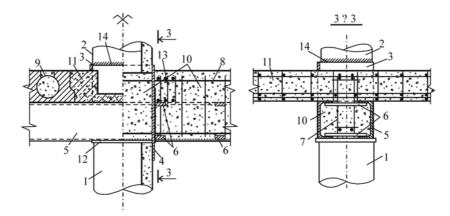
The scheme of the rigid connection of a hollow concrete-filled circular steel tubular column and a continuous composite beam: 1-lower composite column; 2-upper composite column; 3-erection ring for upper column; 4-joining the external steel shells of lower and upper columns by welded reinforcing bars; 5-steel twin-channels of composite beam; 6-batten-plates of beams as partial shear connectors of concrete core; 7-cages of steel reinforcement of beams; 8-additional longitudinal steel reinforcing bars going through the connection and joining cages of beams; 9-pre-cast multi-core concrete slab; 10-cast-in-situ concrete; 11-cast-in-situ bracing concrete slabs; 12-steel head-plate of hollow concrete-filled column; 13-re-bar cage of bracing slabs; 14-site weld
